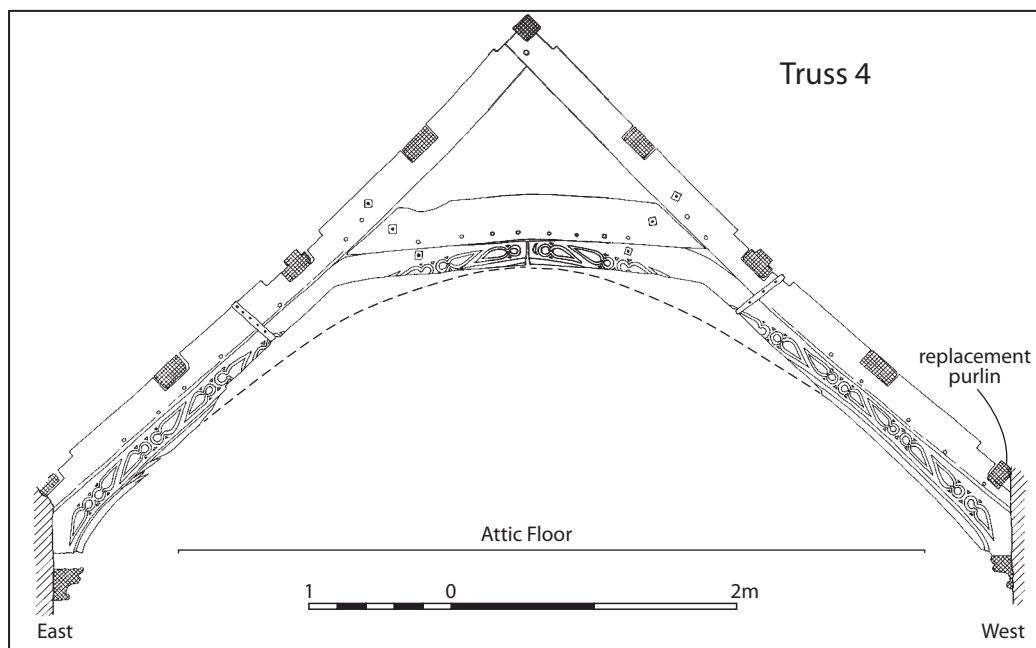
The early 16th-century roof of the west wing; elevation of Truss 4
